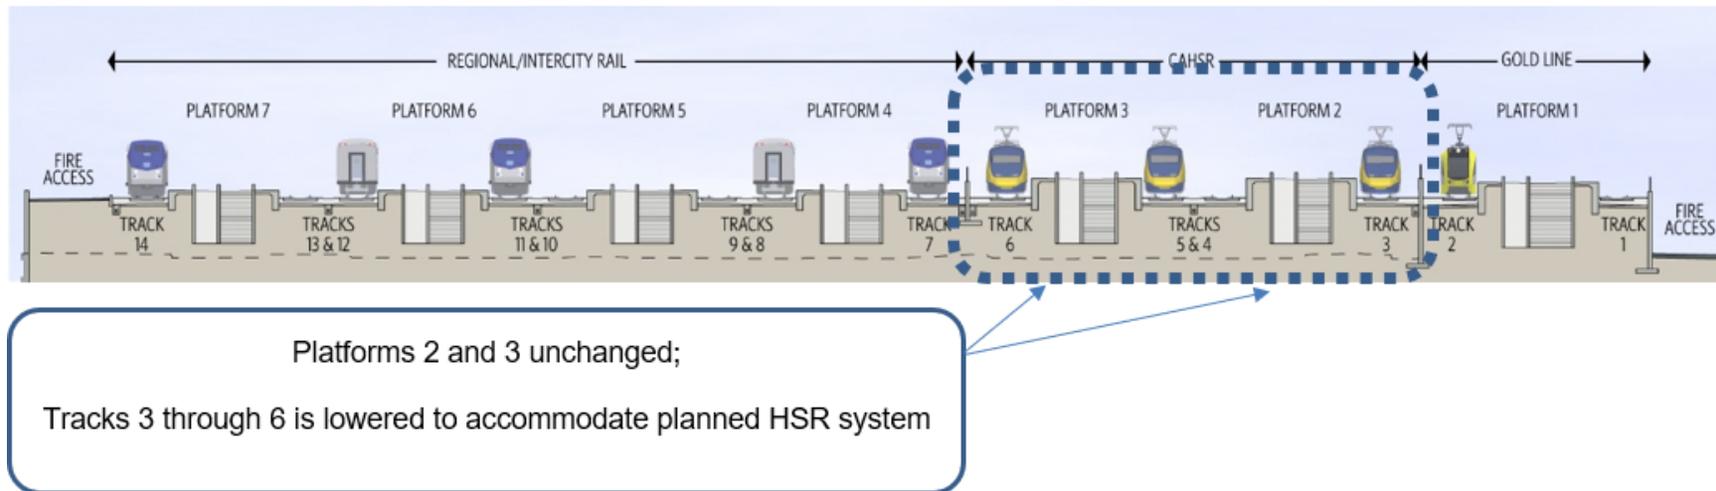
Cross Section of Rail Yard (Full Build-Out with High-Speed Rail Condition) – Looking South
